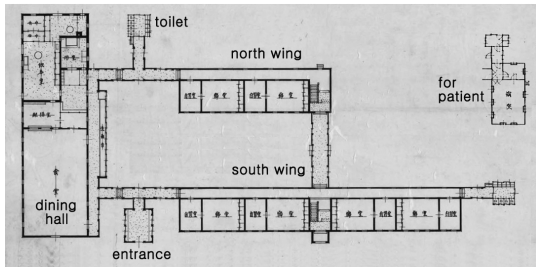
1<sup>st</sup> Floor plan of dormitory [20]
